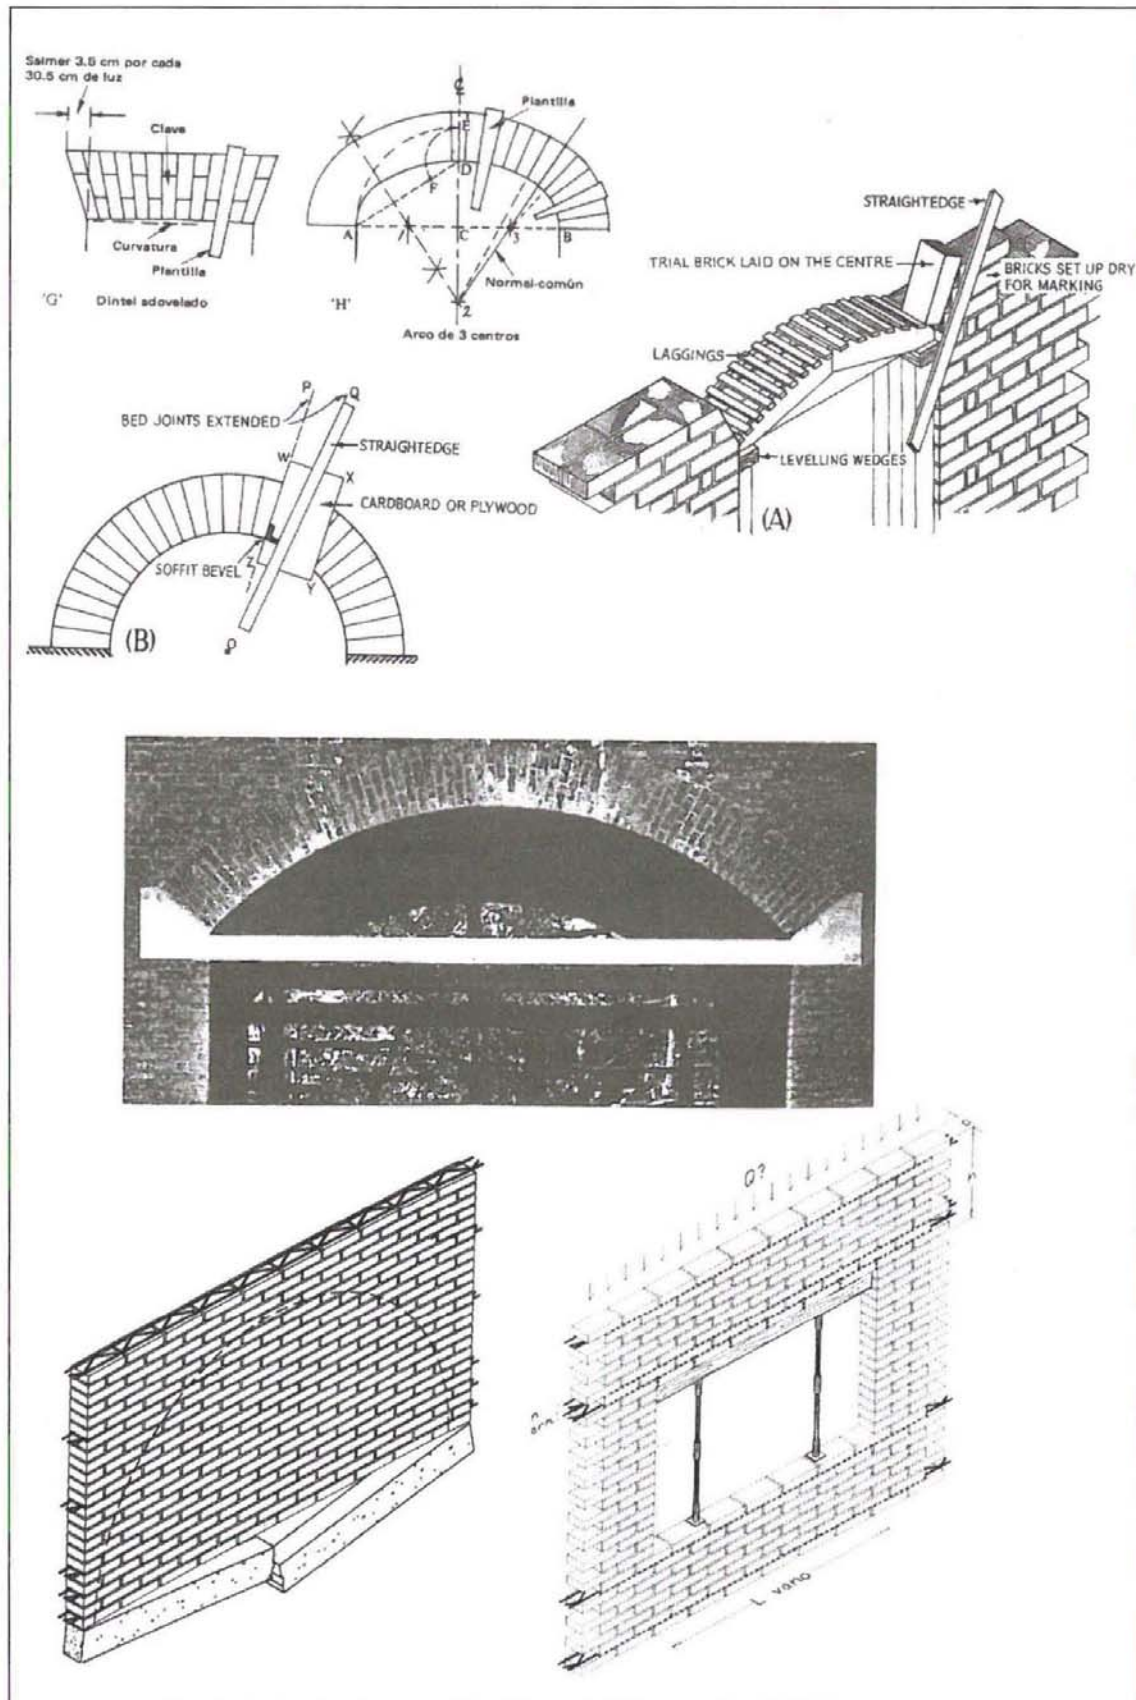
Kahn Arch in Bangladesh: Segmental arch tied with reinforced concrete Blind arches of tied reinforced masonry
